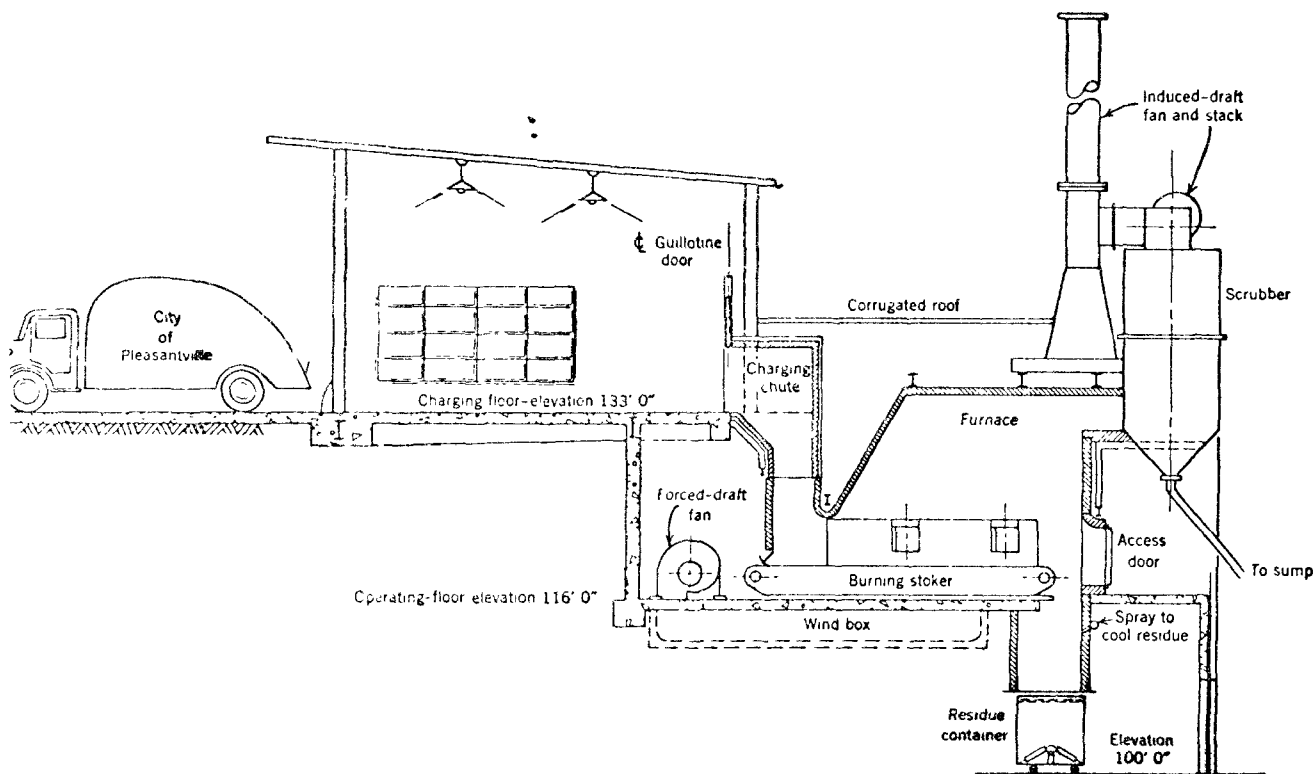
TYPICAL LAYOUT FOR ABOVE GRADE STORAGE WITH SUBGRADE CHARGING CHUTE.³
